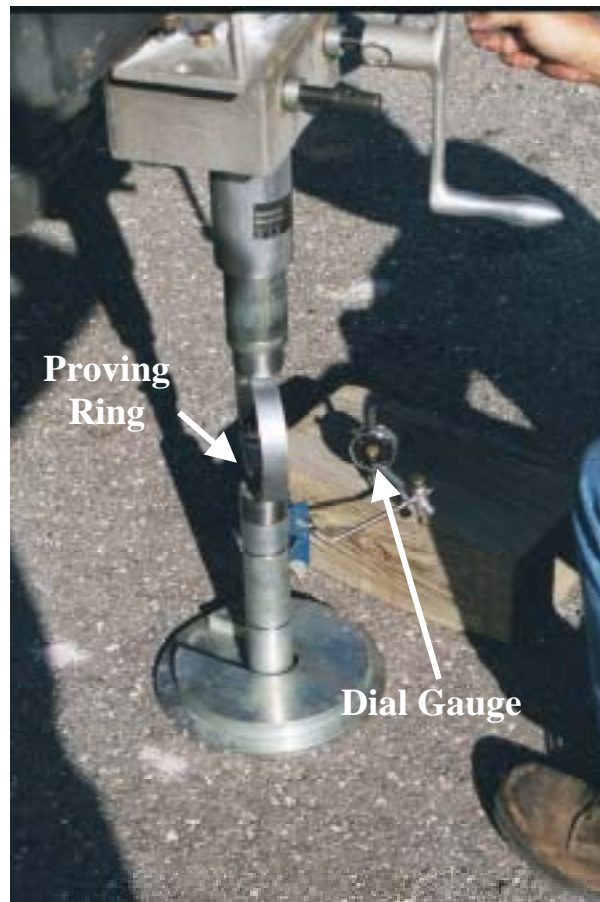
Field California Bearing Ratio Testing Apparatus
